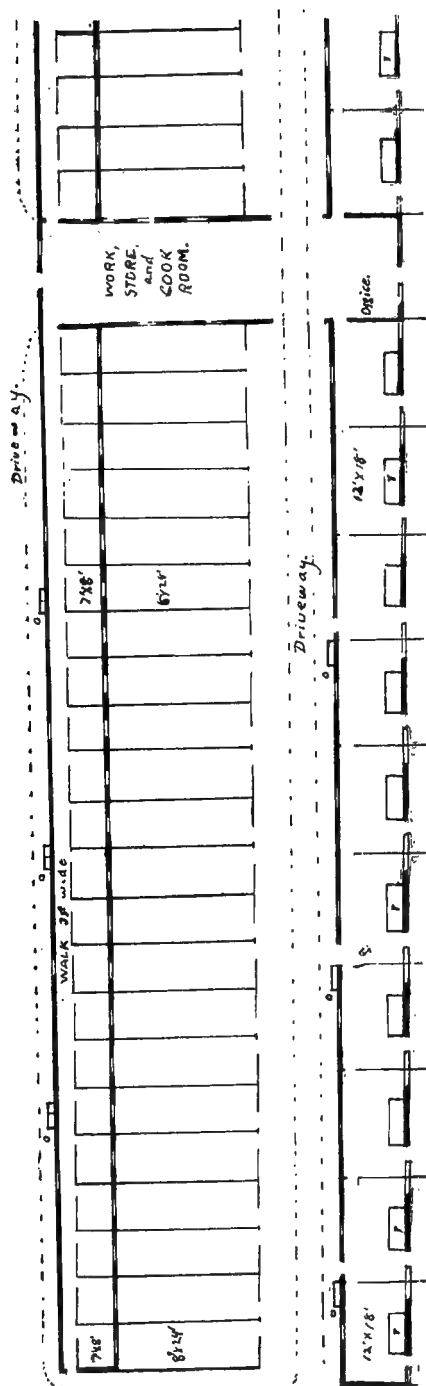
Ground Plan of West Wings of Laying and Brooder Houses in Fig. 23. 000, droppings boxes, illustrated in Fig. 27.
